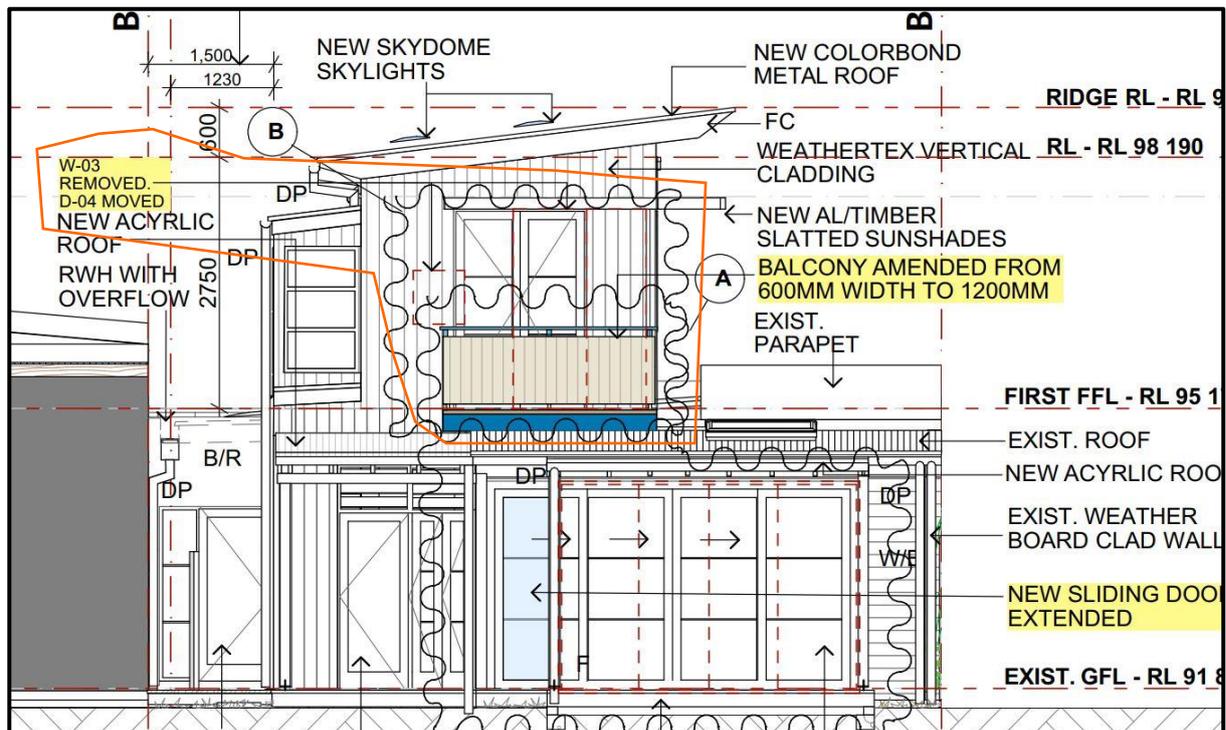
South elevation showing deletion of window and relocated balcony door (outlined in orange)
